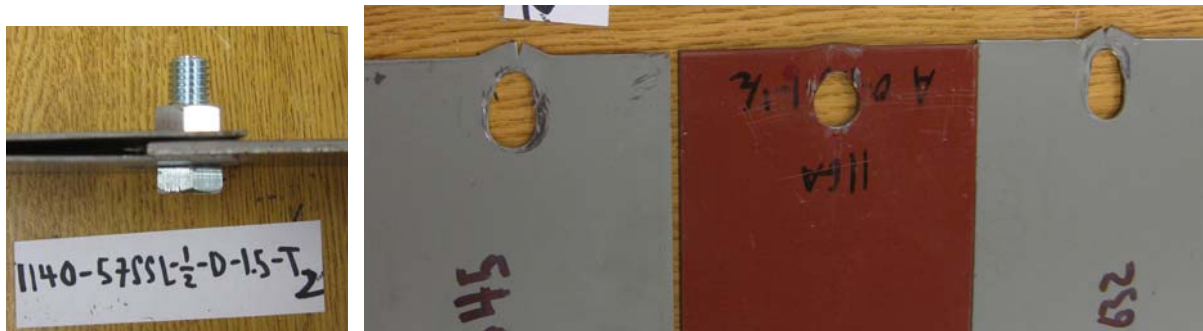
Shear Failure of Test Specimen 1140-57SSL-1/2-1-D-1.5-T2
